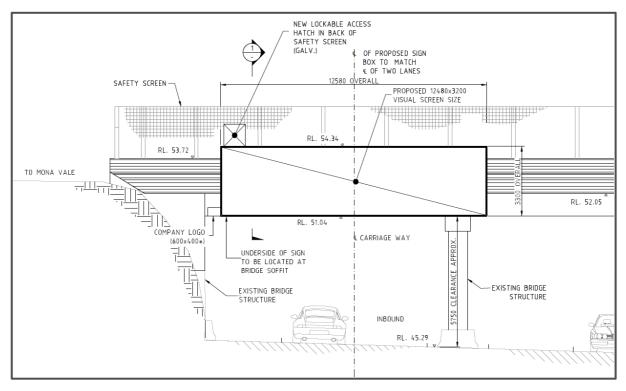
| Elevation (source: Applicant's Engineering Plans)
